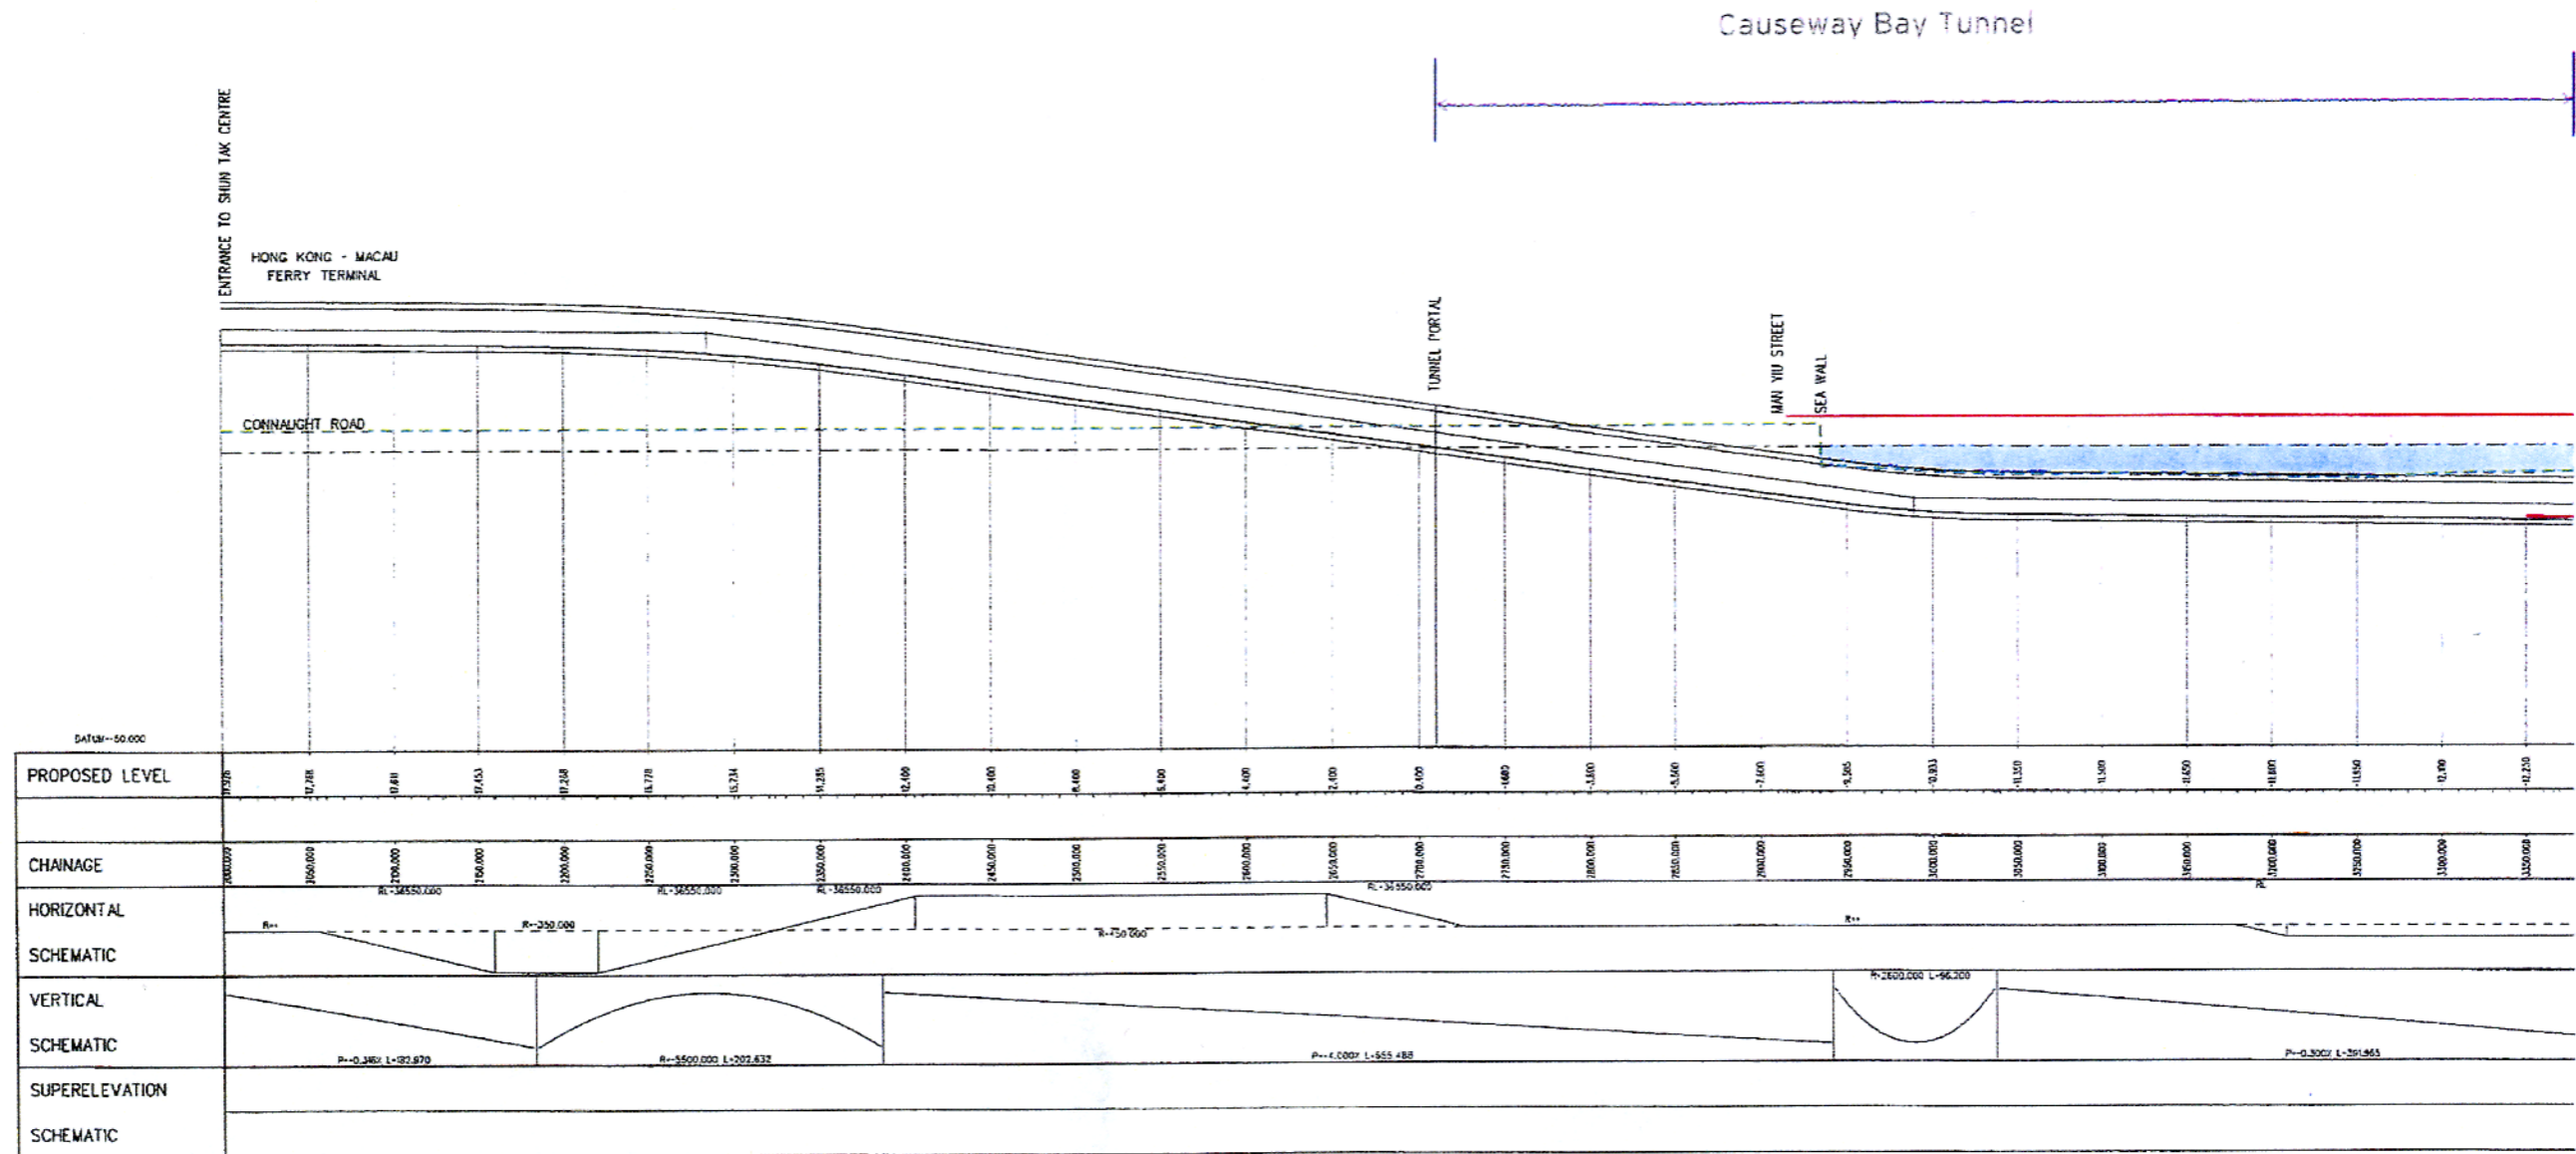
Vertical Elevation of Bypass (1 of 4)
